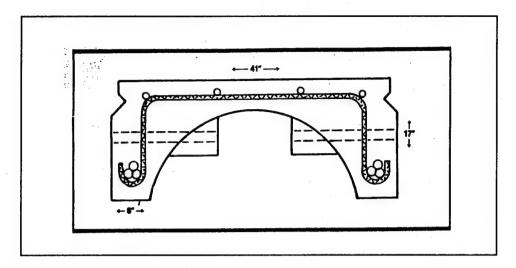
Cross section of precast beam showing placement of steel reinforcing in short-span bridge (from *Roads & Bridges* 1985)
